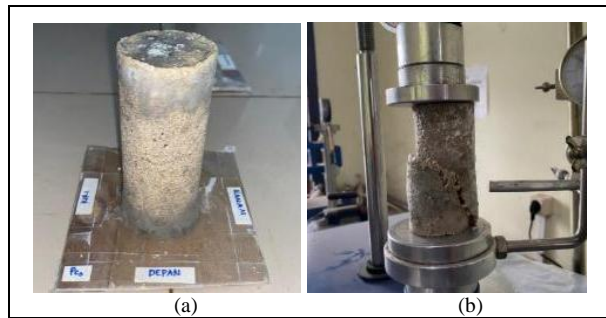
Specimen conditions before and after unconfined compressive test at S-2 (washed and oven-dried treatment): (a) specimen condition before loading, and (b) specimen failure pattern after testing
